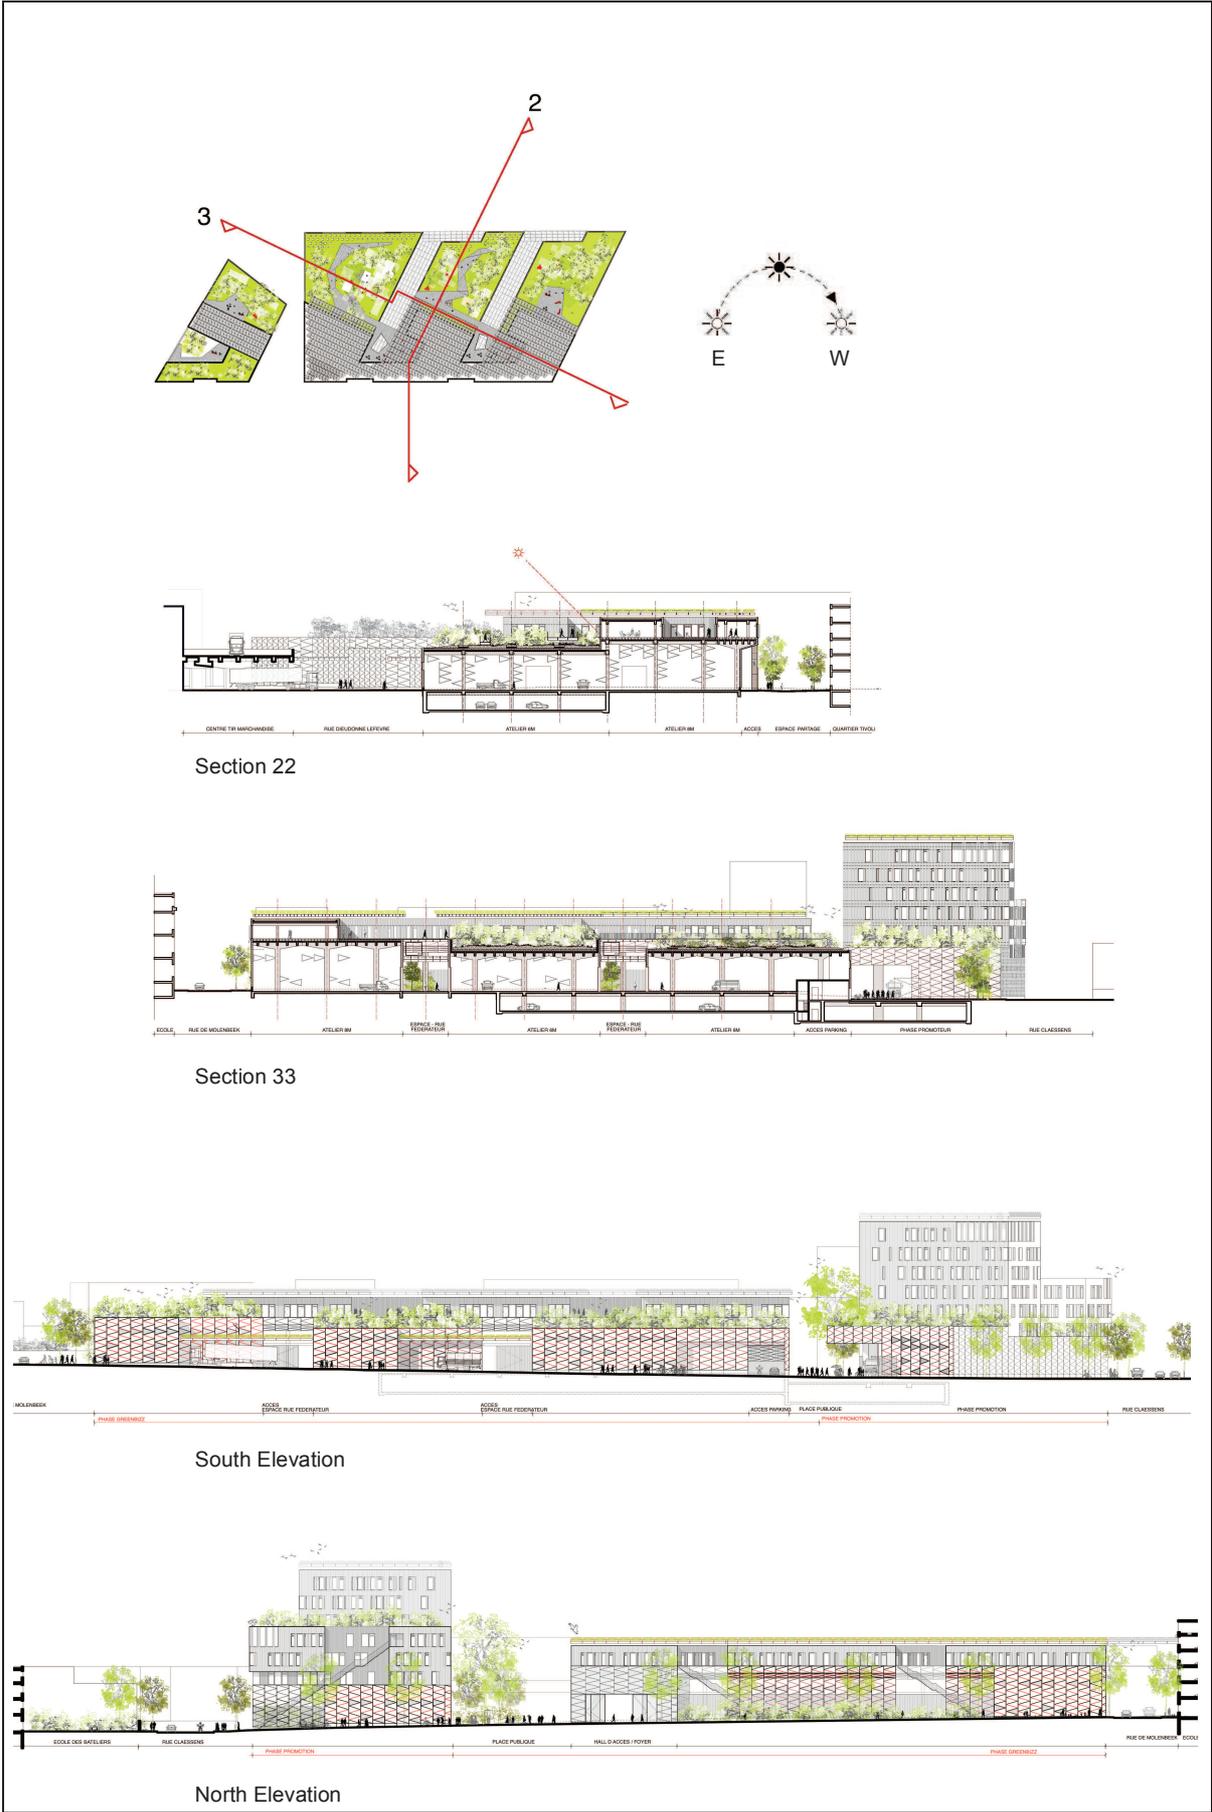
FIG VII: PLANS, SECTIONS & STREET ELEVATIONS
